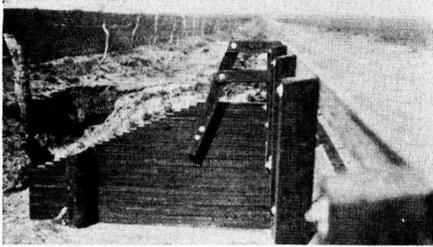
Wing Wall Detail in Laminated Timber. Courtesy of American Wood Preservers Assn.
